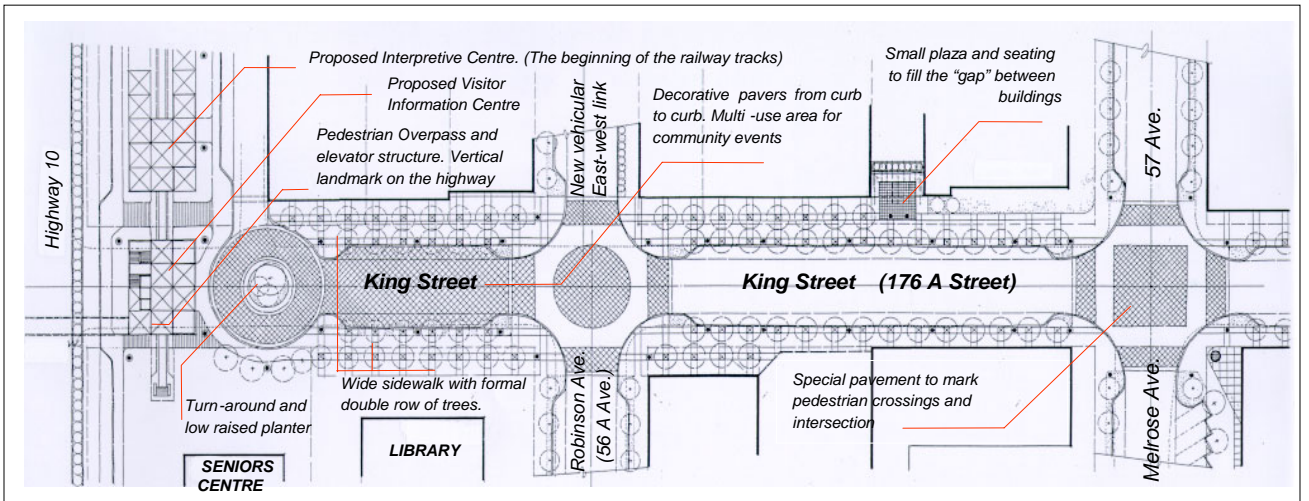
King Street at intersection with Highway No.10 and turn-around
